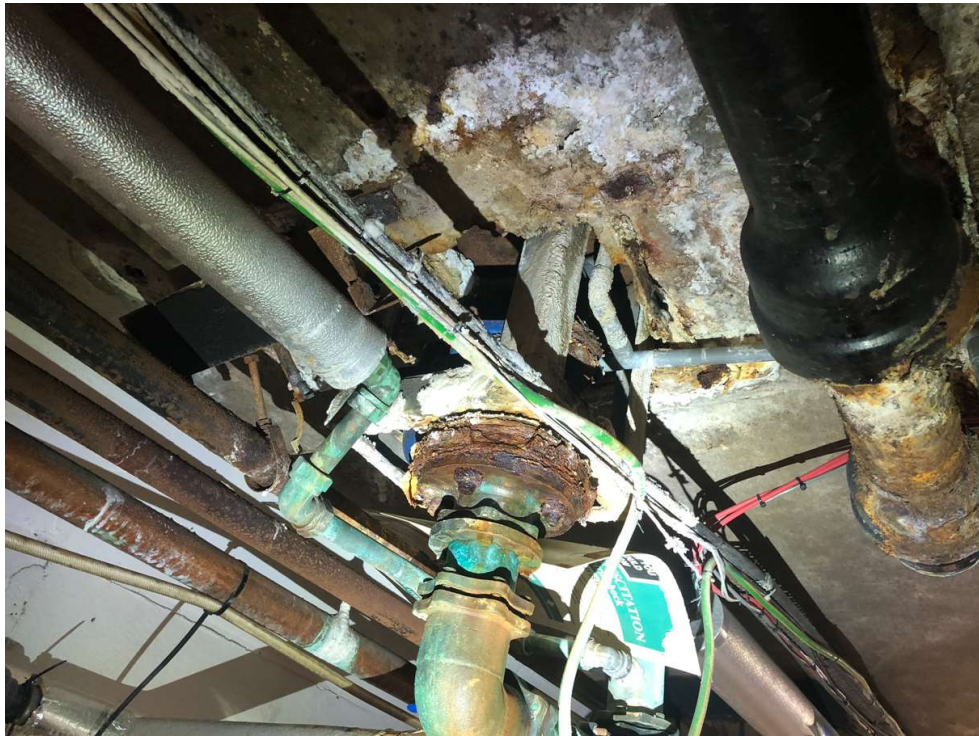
Corroding pipework adjacent to the main swimming pool tank.
